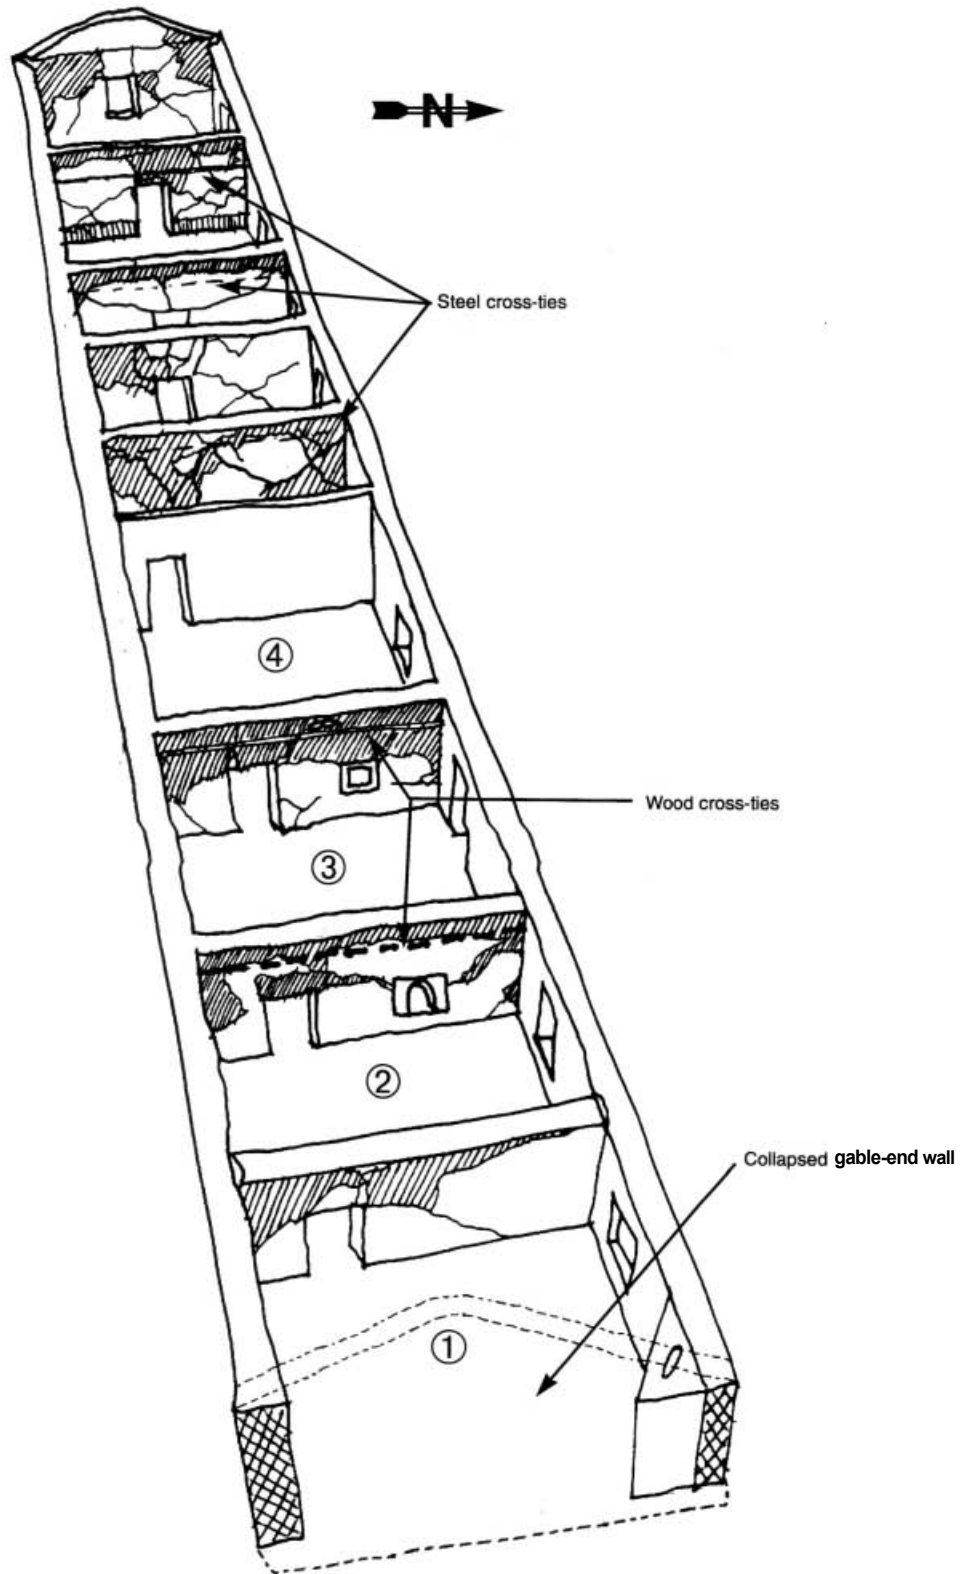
De la Osa Adobe*. Drawing of earthquake-damaged building from the east end.
